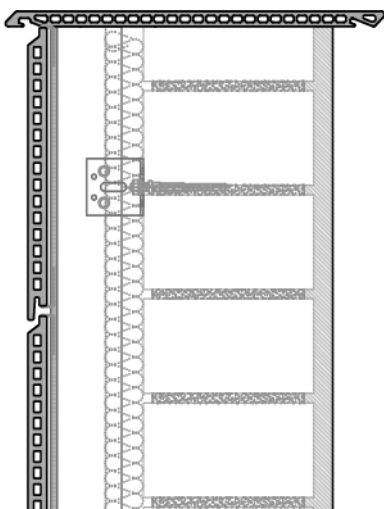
Horizontal section. Faveton® SAH Acqua 20-V.
